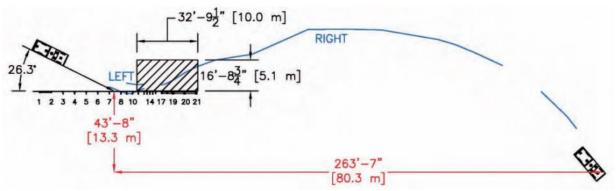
Test Impact Drawings for Test No. MWTSP-2.
